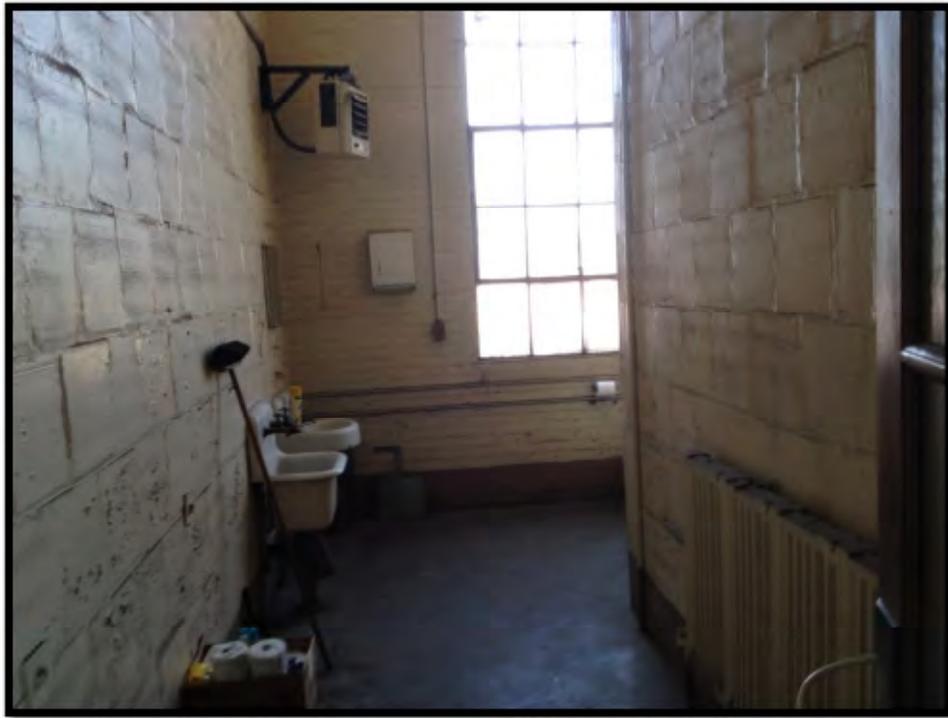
View of bathroom area on 2<sup>nd</sup> floor of building.
